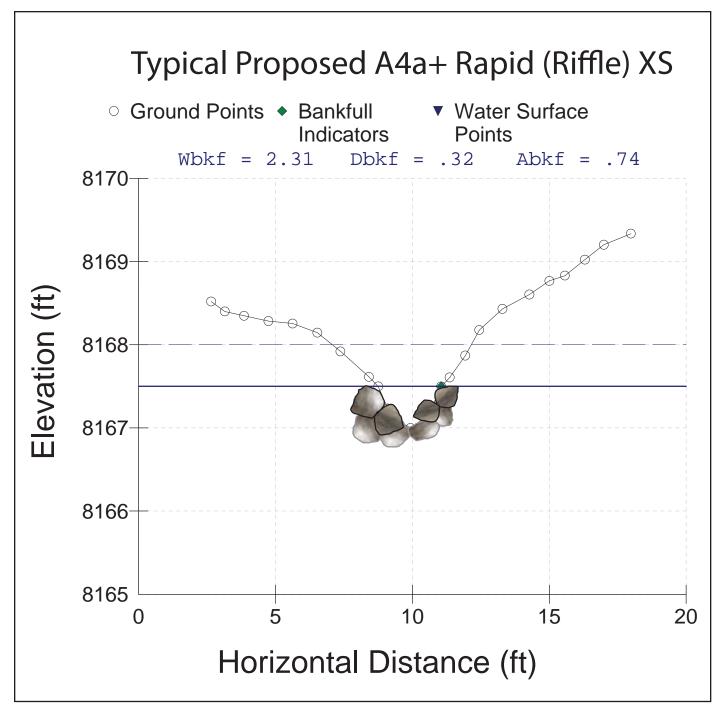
The typical rapid/chute (riffle) cross-section for the proposed A4a+ Stable step-pool design.
